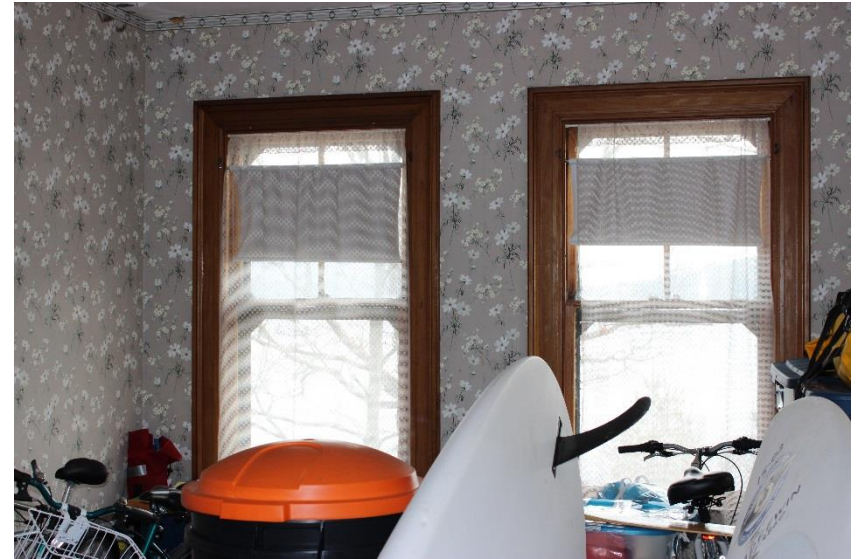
Second floor southeast bedroom (S7), view south (Peebles 2017).
